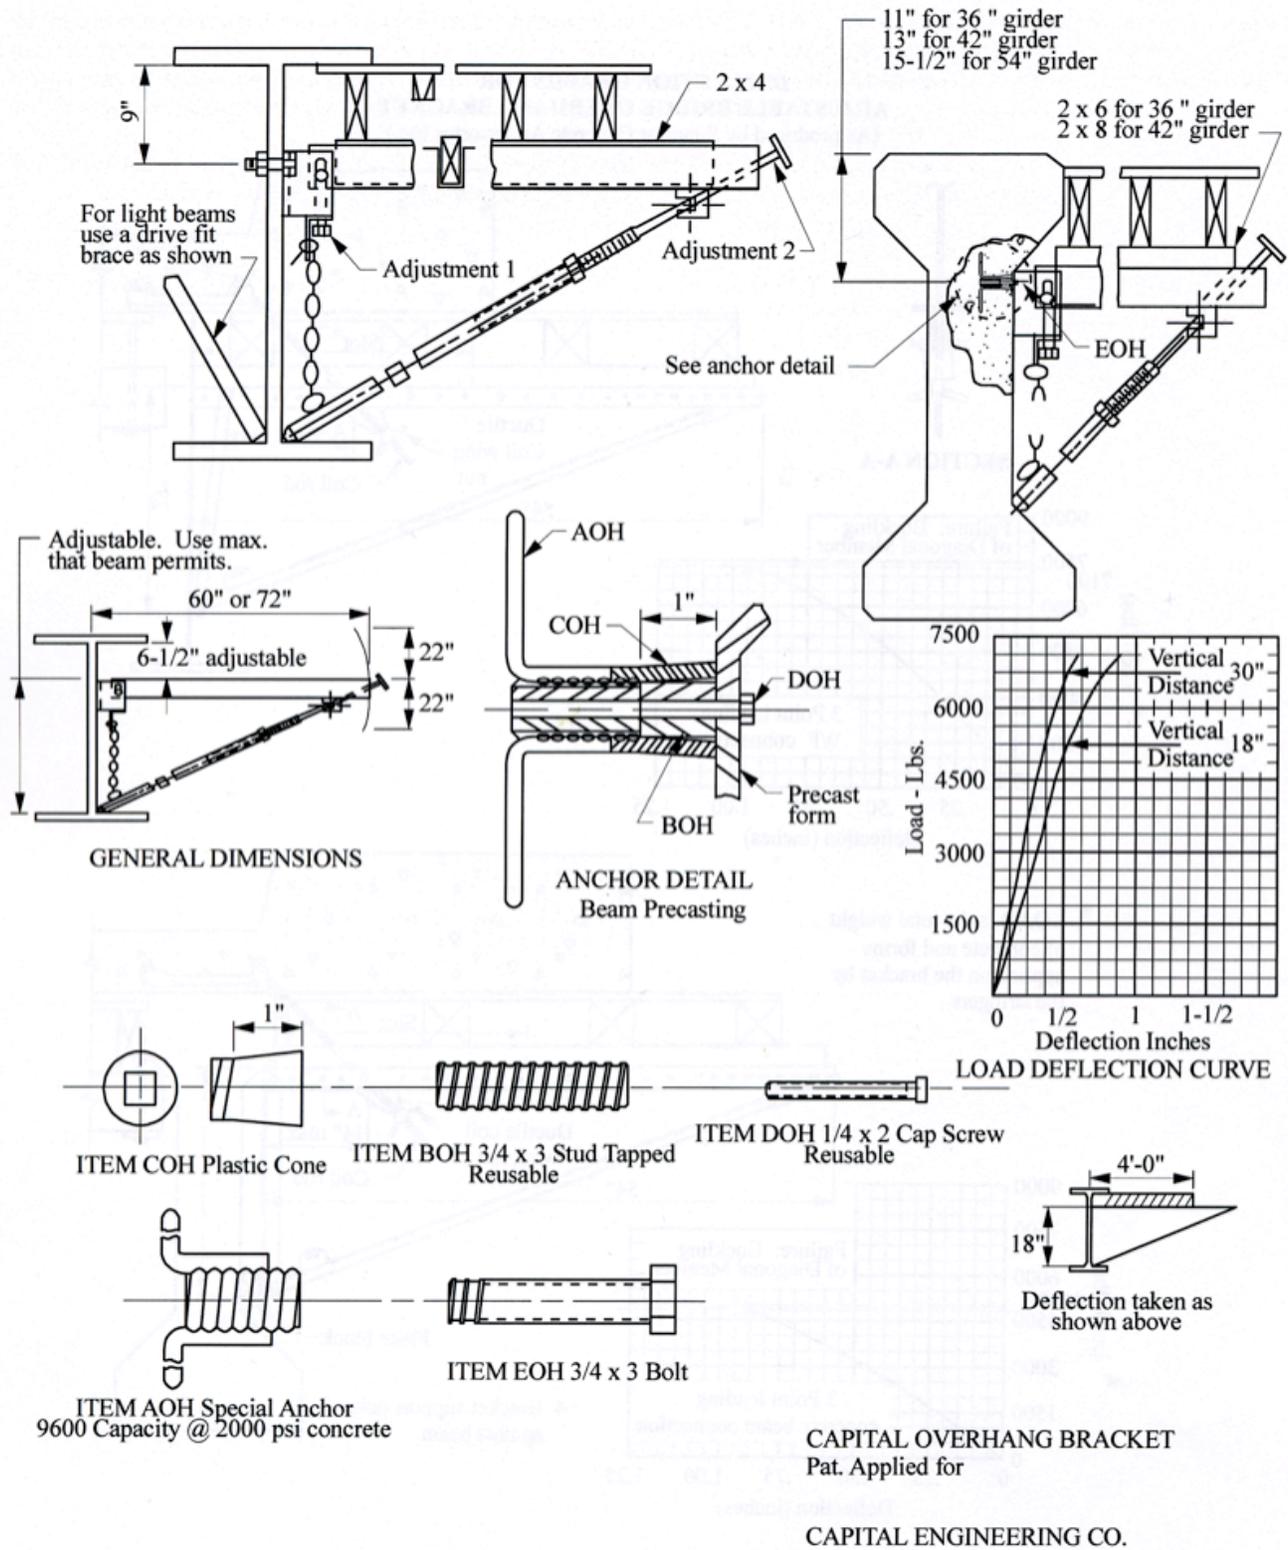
Engineering information and design details for the use Capital Overhang Brackets manufactured y Capital Engineering Co.
